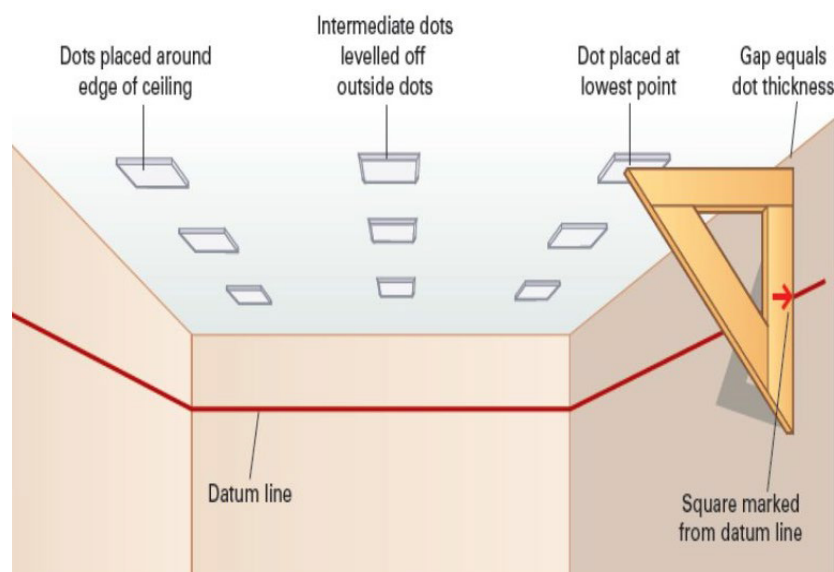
Establishing datum/levels and setting out fixing points
